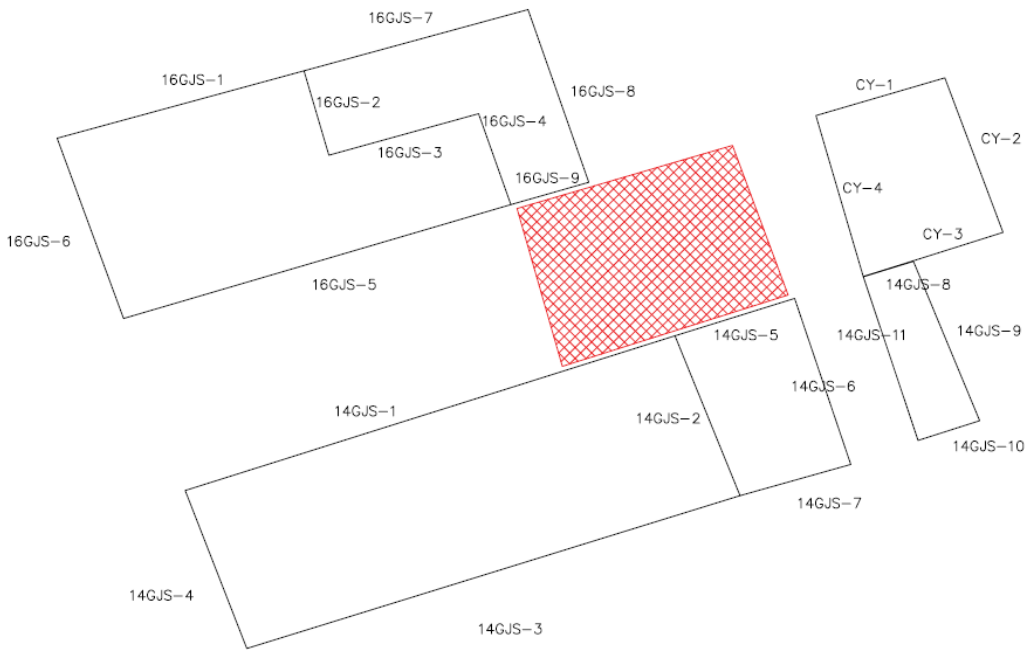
Nomenclature for building/masonry wall elements indicated in black and simplified excavation outline adopted in Xdisp indicated with red. Idealised proposed excavation area indicated by red hatch.
